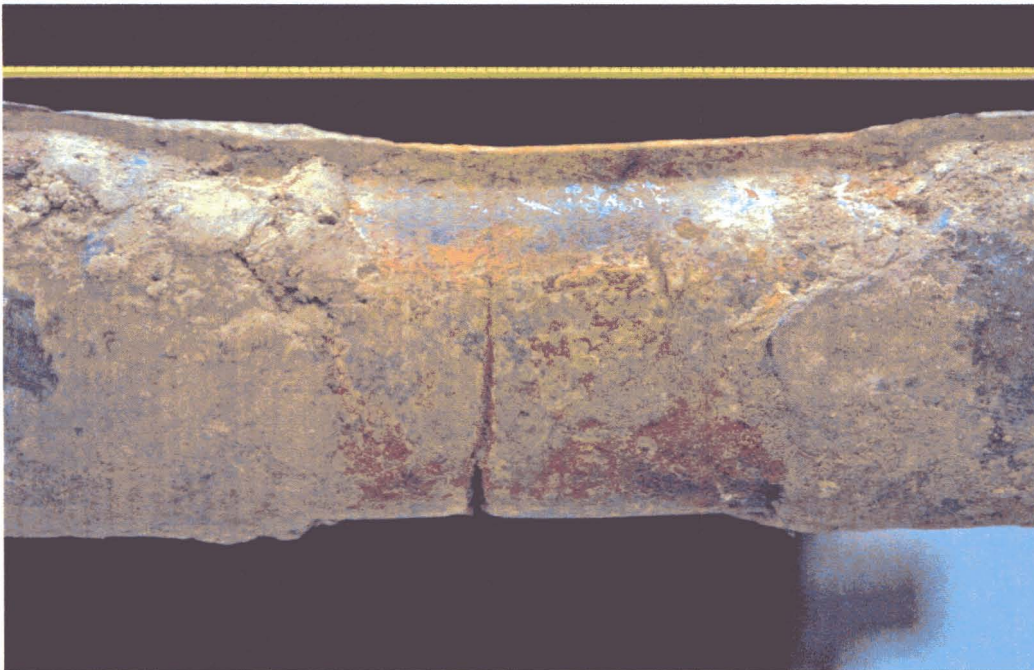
Pipe with crack oriented on bottom as occurred in the ground.
